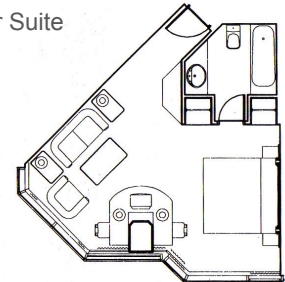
General Floor Plan- Not to Scale (Lawson, 1995)
